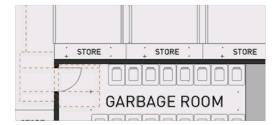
BASEMENT GARBAGE ROOM AND BULKY WASTE STORAGE
